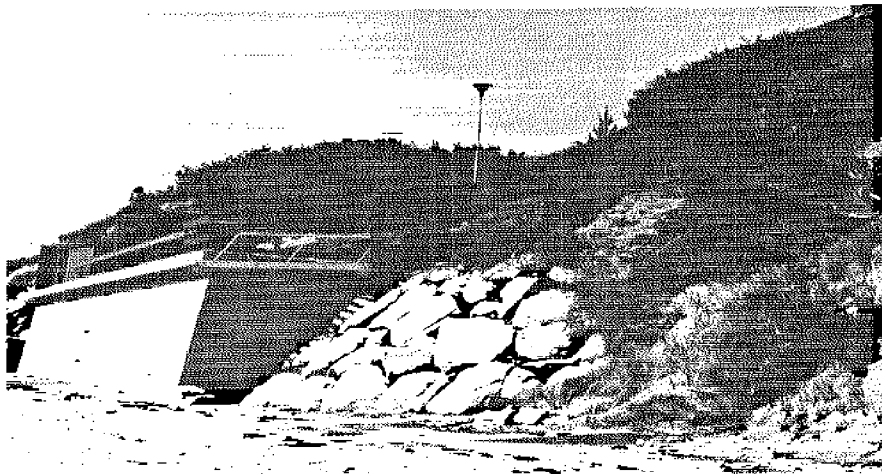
Sta. IIIb. Seawall and terraced deck, looking southwest.
